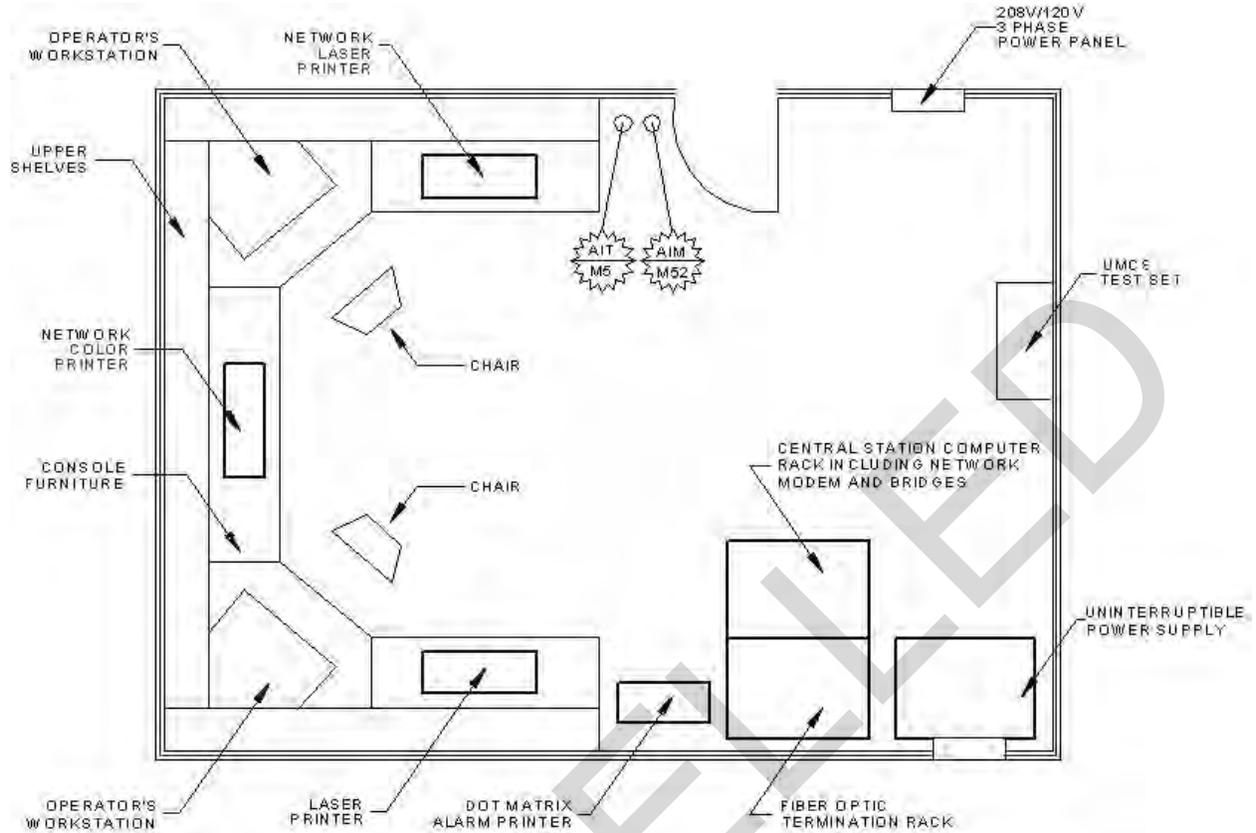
Typical Central Station or Island Station Equipment Room.
